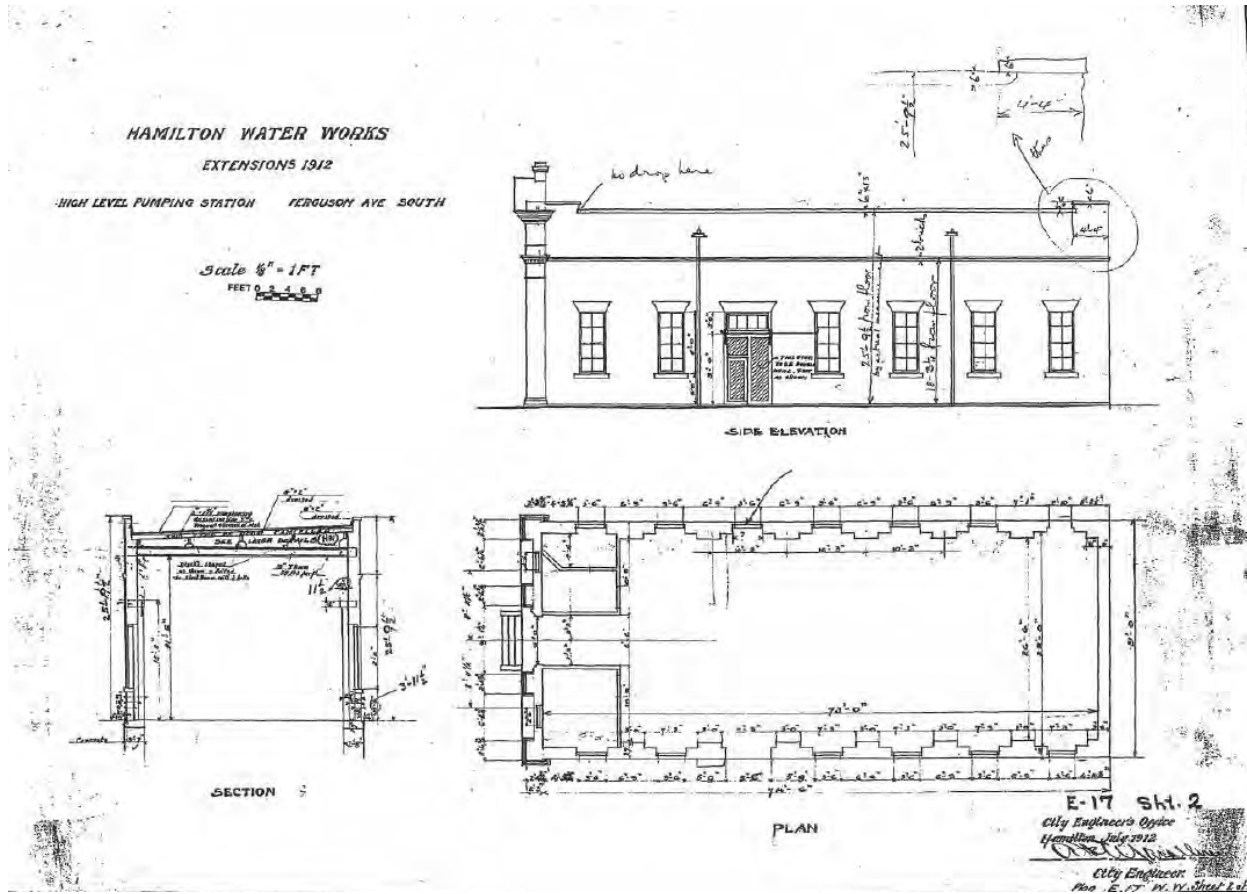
South elevation (top), section (bottom left), and plan (bottom right) of the new station (City of Hamilton 1913).
